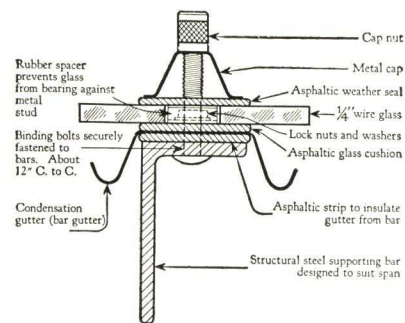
Cross-sectional View Showing Details of Robertson Glazing Construction
